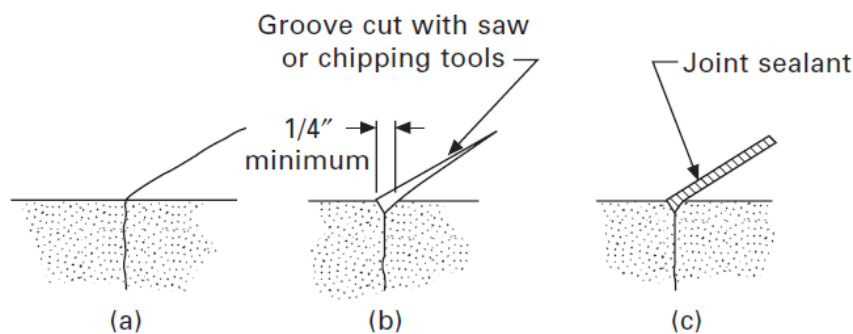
Repair of crack by sealing: (a) original crack; (b) routing; (c) sealing (Johnson, 1965)
